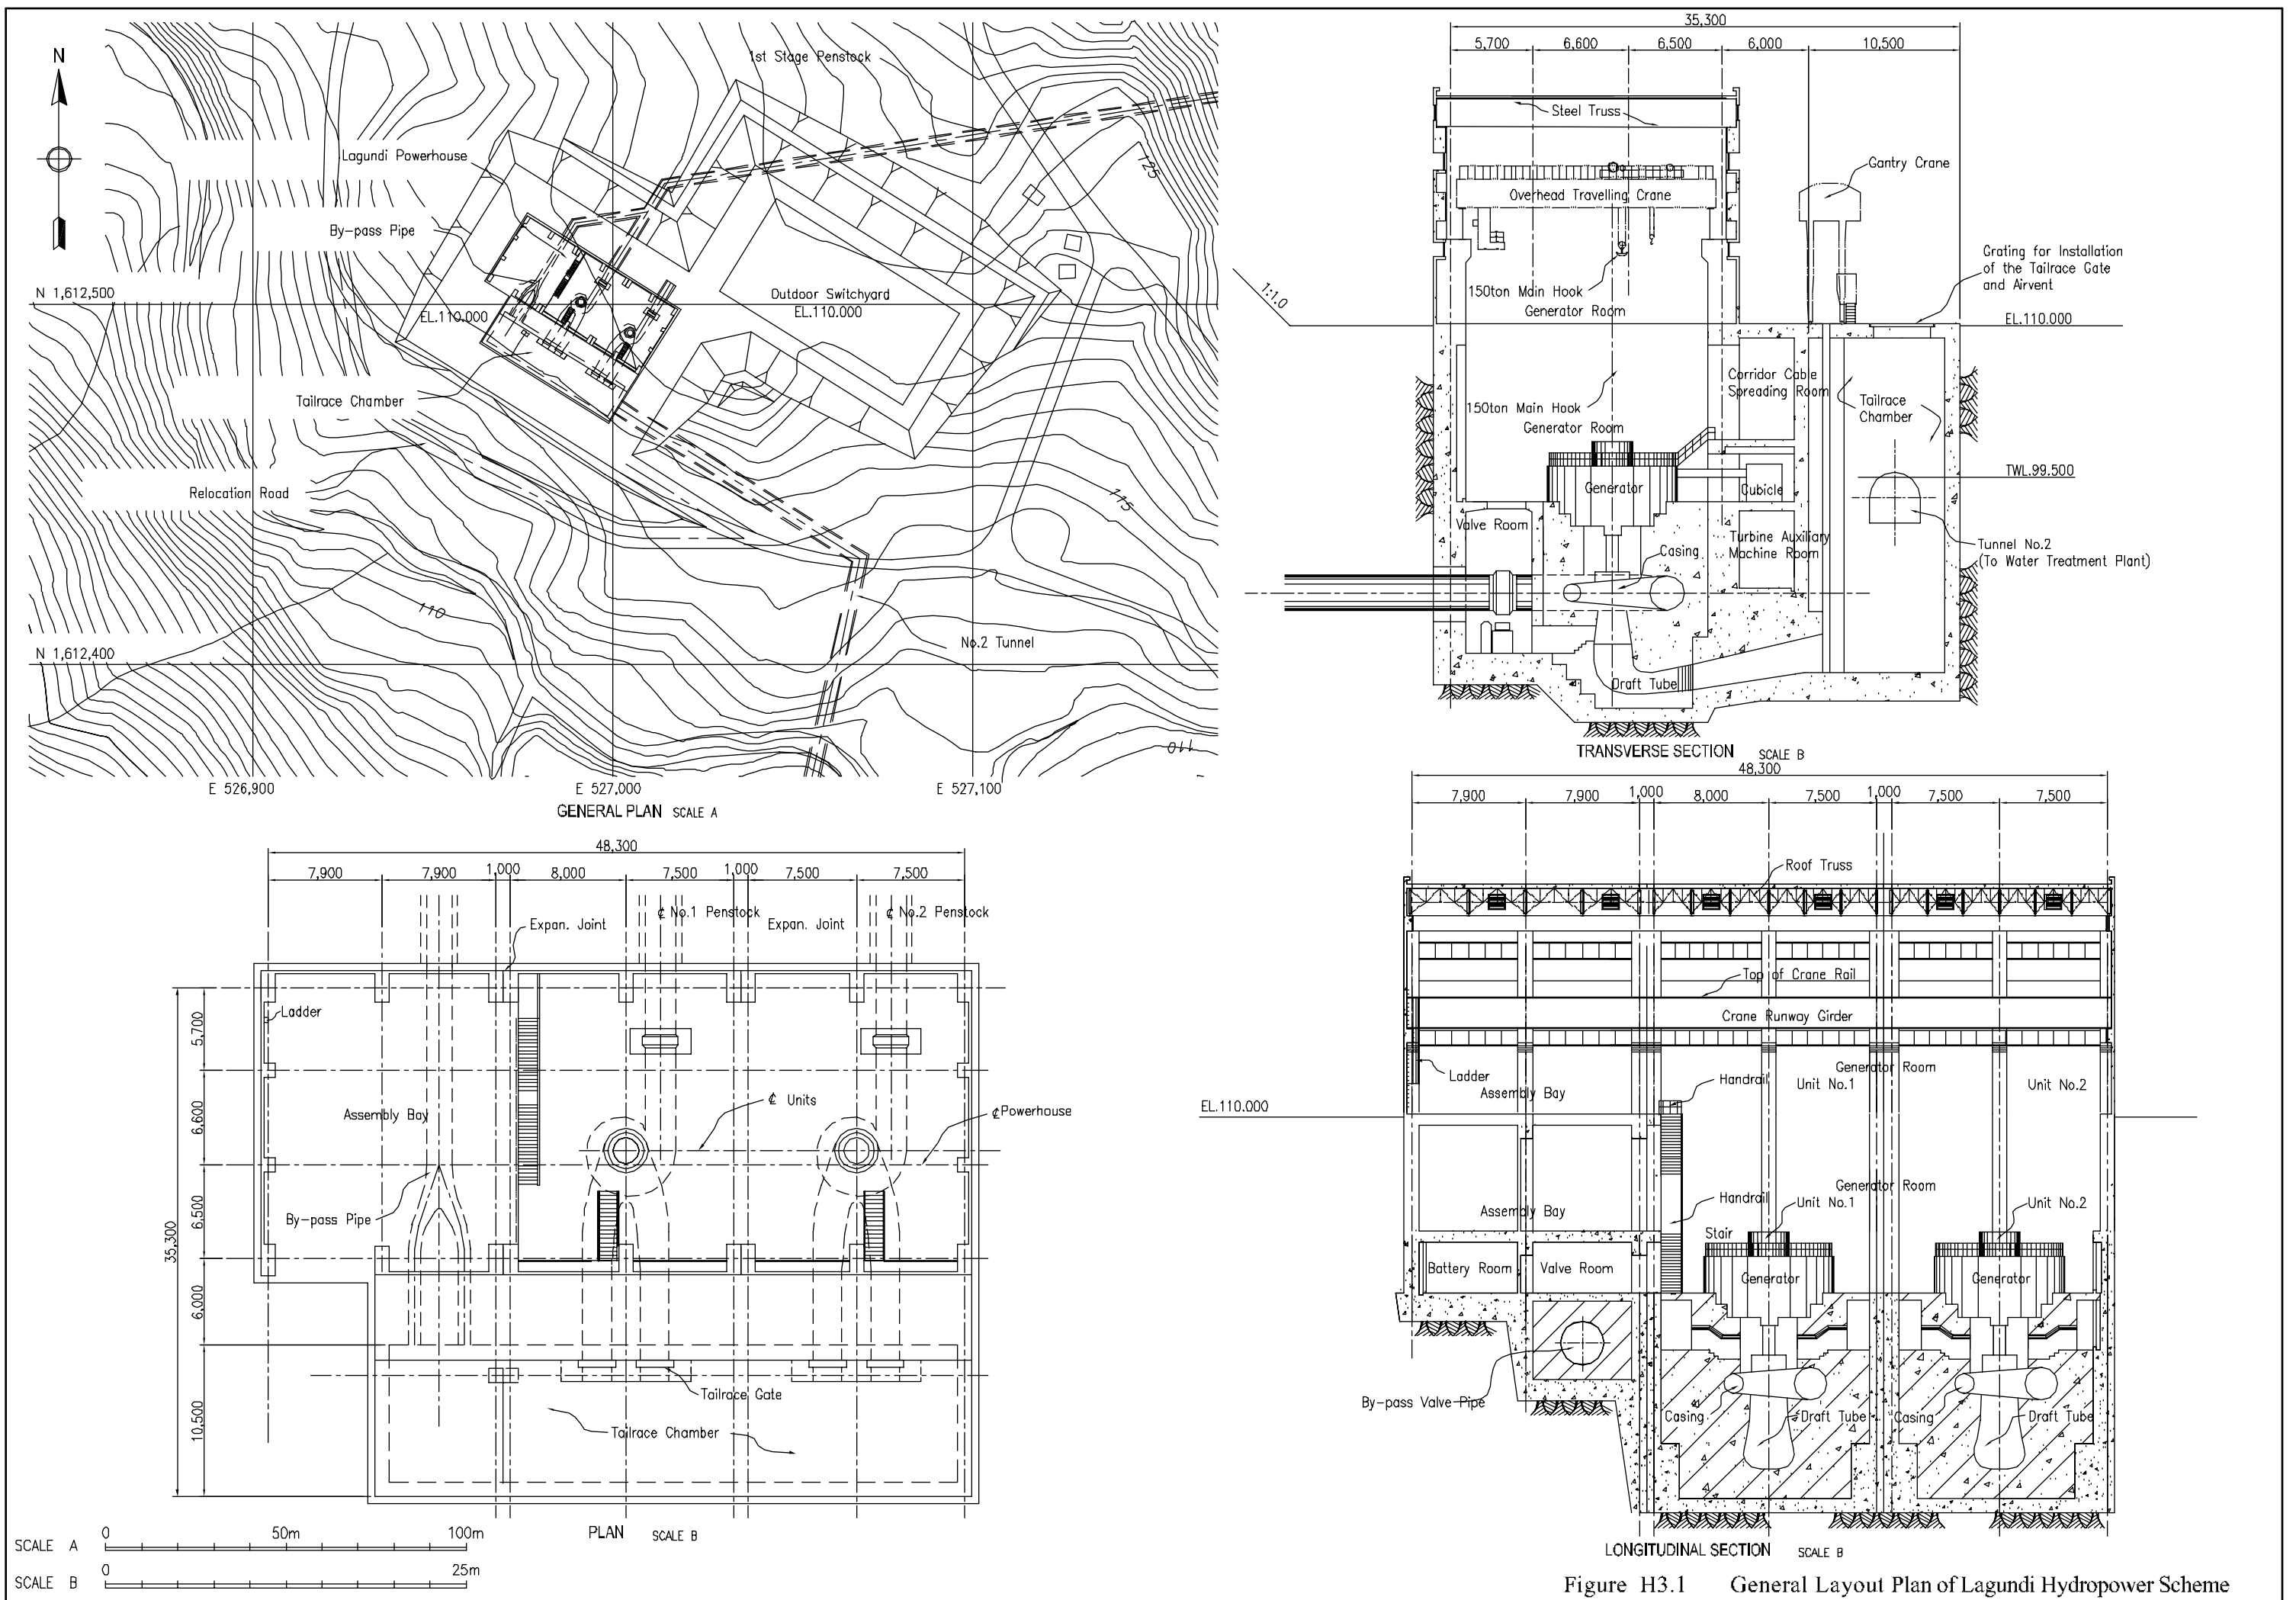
General Layout Plan of Lagundi Hydropower Scheme
